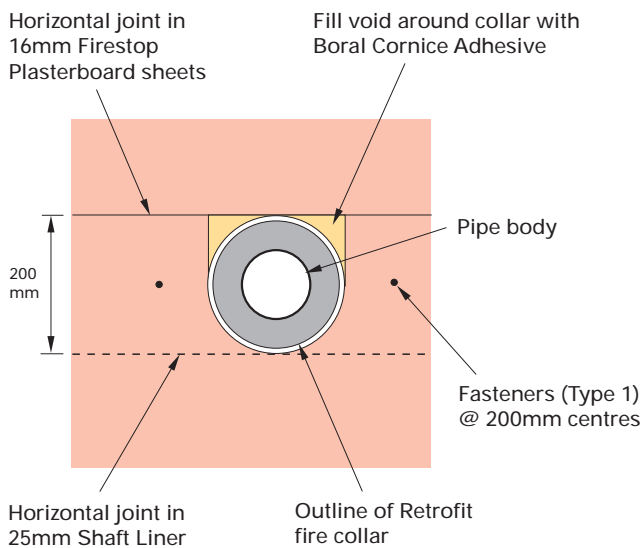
Typical plasterboard installation around existing Pipe & Collar FRL NA/120/60
